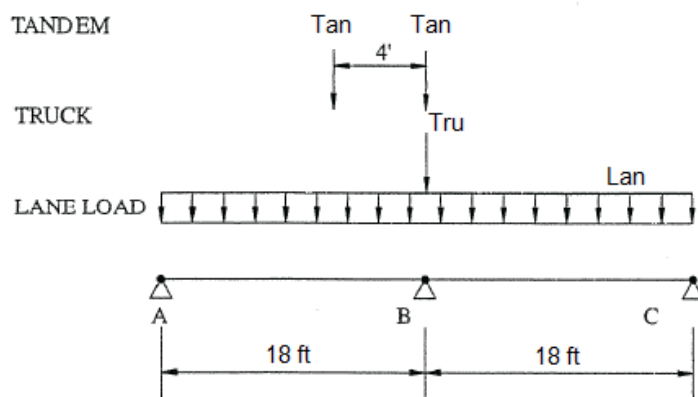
Critical Live Load Position for Reactions on Floor Beam
